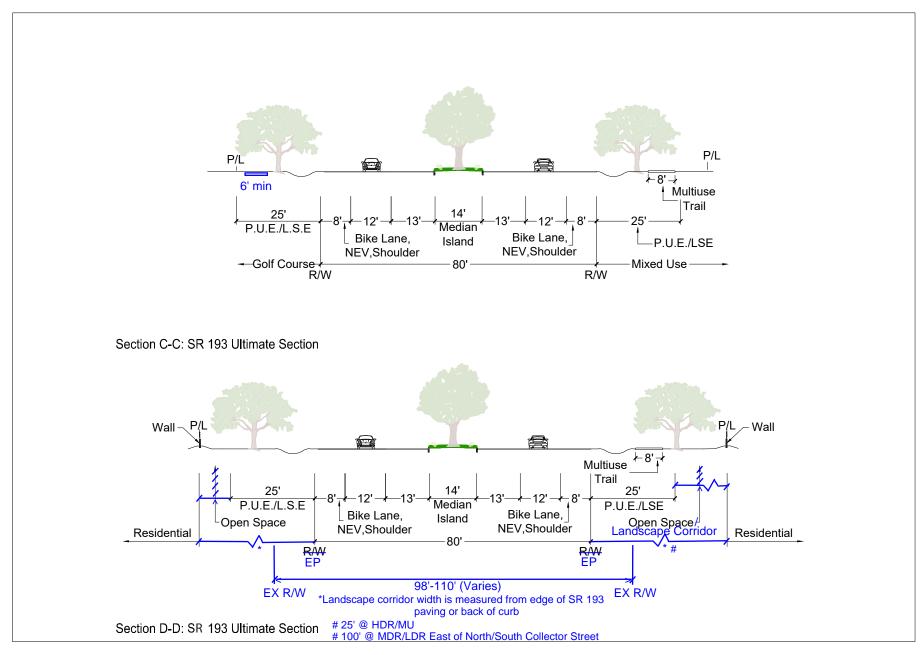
Major Arterial Street Cross Sections - SR 193
